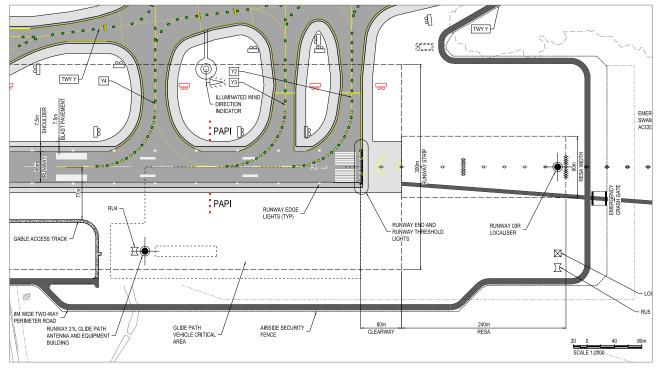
Proposed new runway instrument landing system location runway 21L Source: Perth Airport
